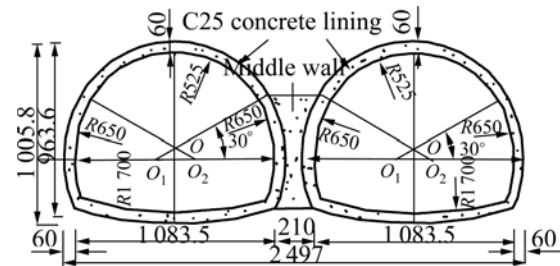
Sketch of multi-tunnel cross section (unit: cm)
